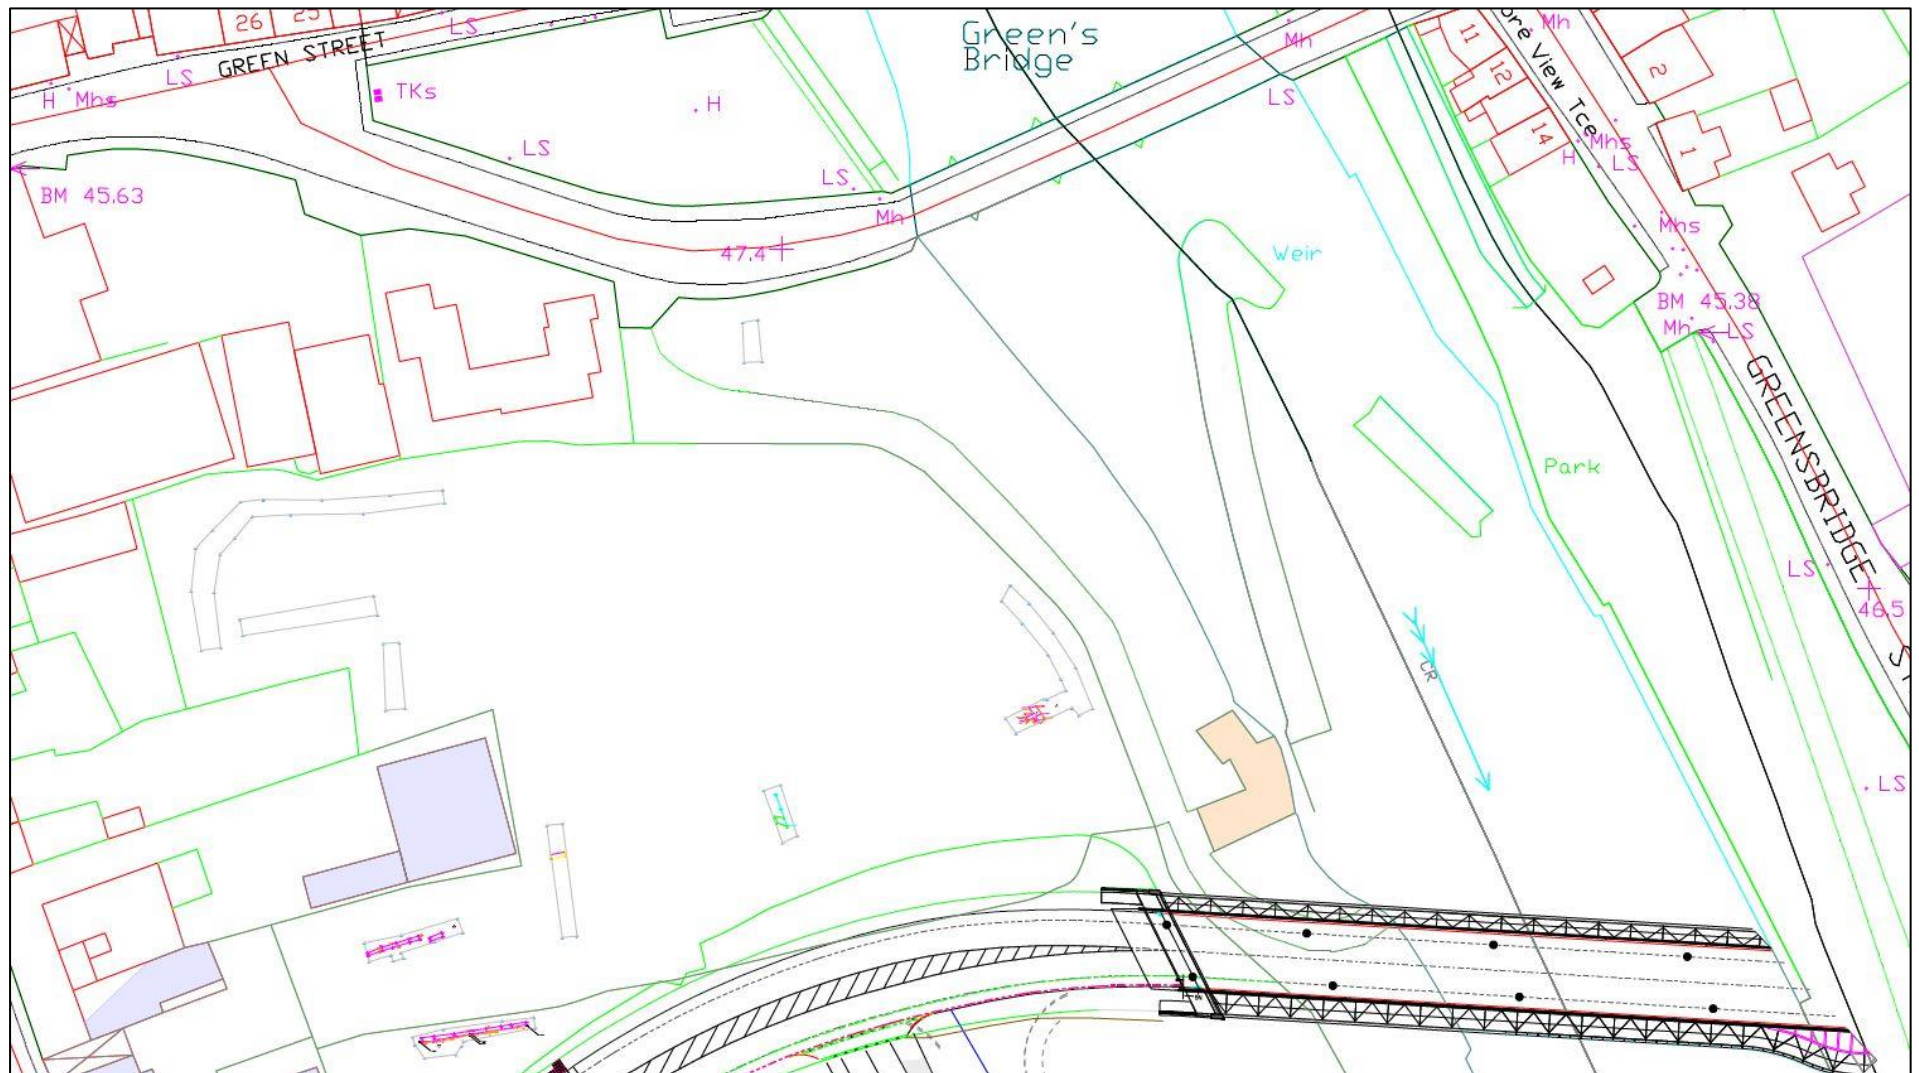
Site layout in relation to the River Nore, Green's Bridge and the KCAS bridge and road. The eleven test trenches and the uncovered archaeology are included.
